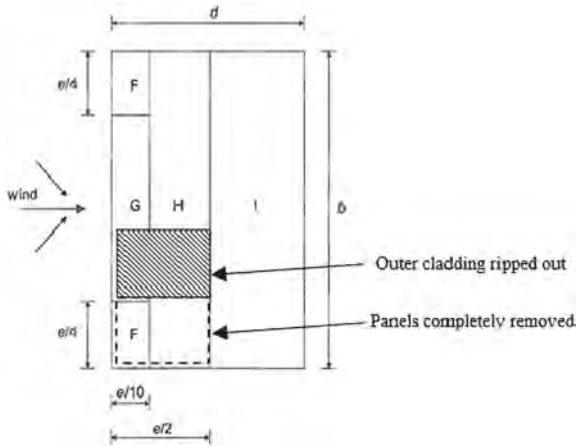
Key for flat roofs (see [18]) and roof areas damaged by wind marked with dashed line (panels removed) and hatches (outer cladding ripped out).
